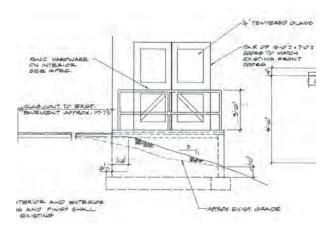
Drawing showing design added east doorway. Note single light-over-single panel design matching that of original doors. No photographic record of these doors has been found; however, the doors currently in place are replacements, as determined by visual inspection of the frame. (BLRI Coll., Drawing No. 106-80002, ETIC)
